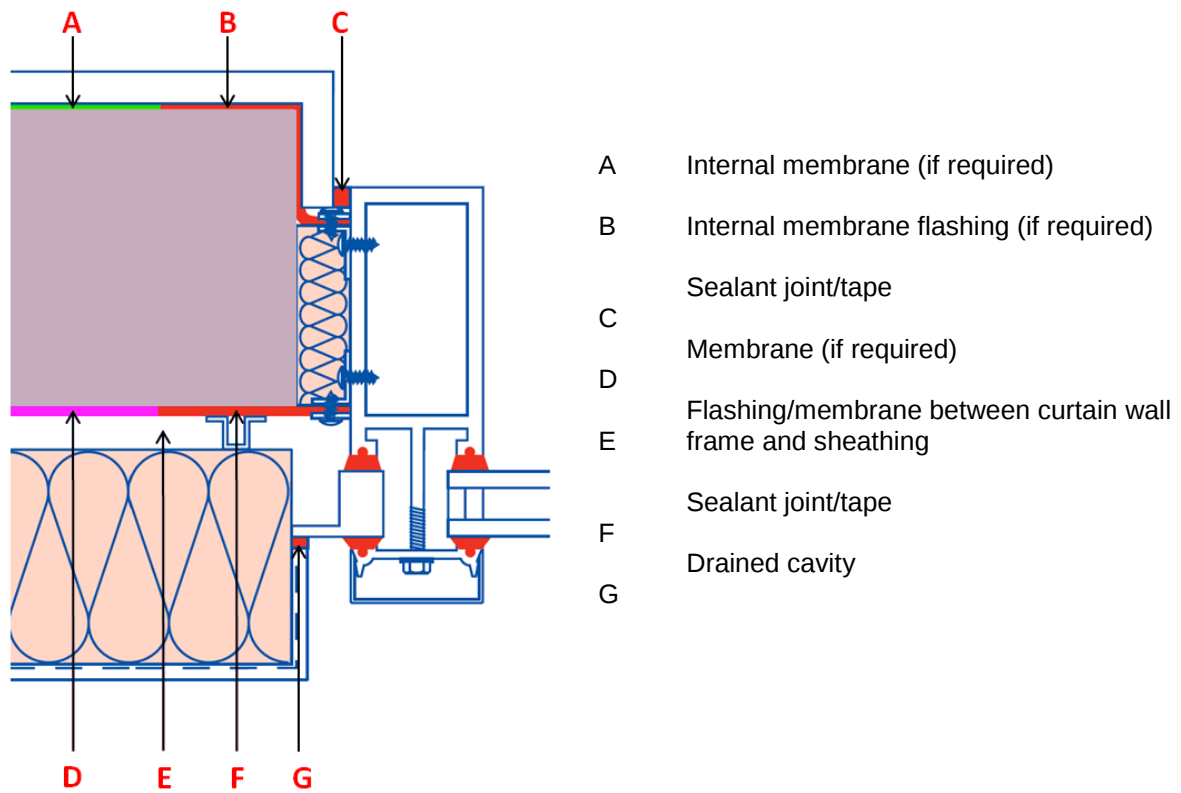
Curtain wall interface with EWIS, solid back wall, cavity
